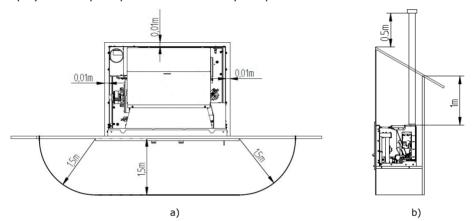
Minimum distances of all surfaces: a) top view of the installation of the equipment; b) side view of the equipment installation
